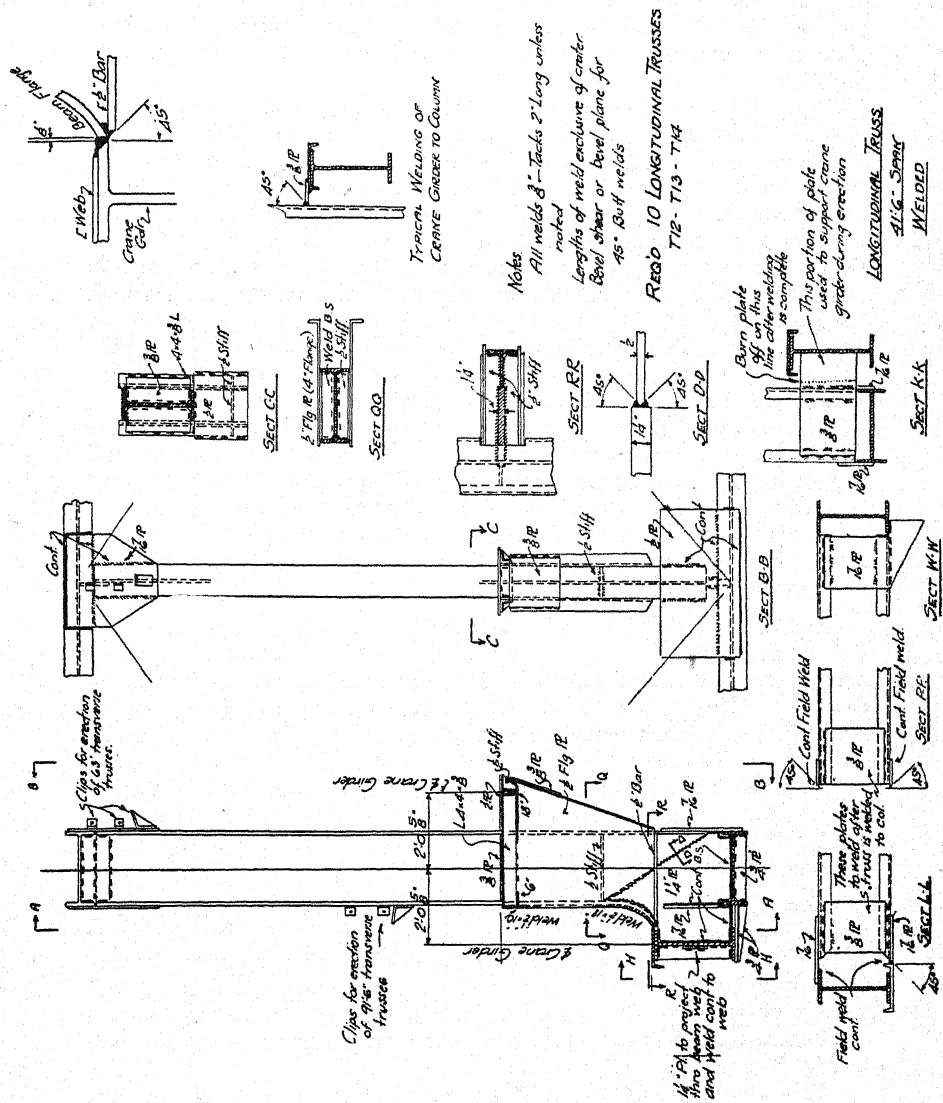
Details of 41½-foot panel of longitudinal truss. See also page 477a.
